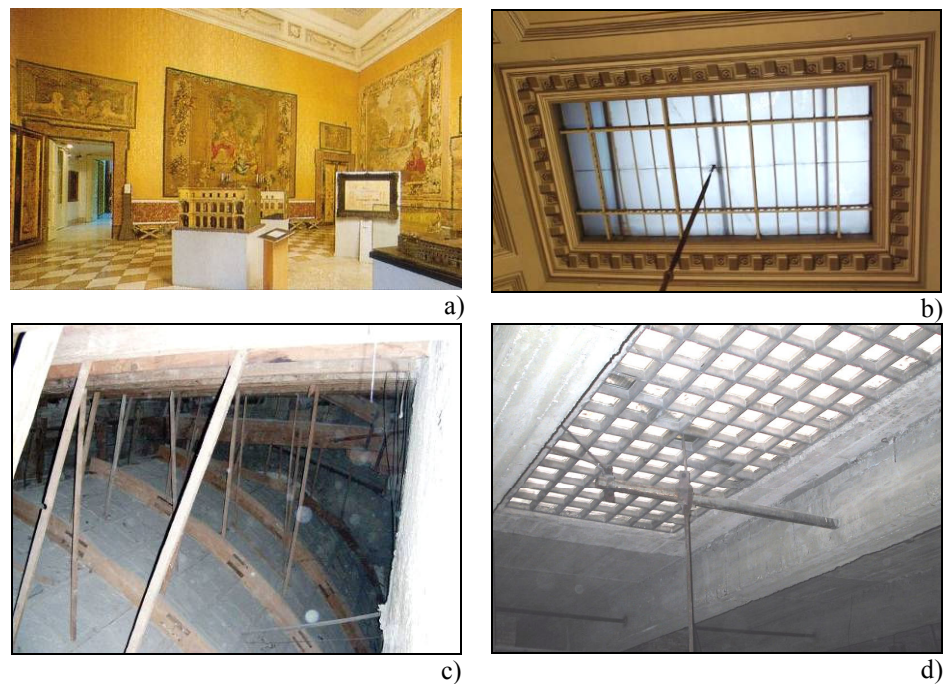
Guard Room (XXIX) – Geometrical survey: a) Internal; b) Central skylight; c) Vaulted ceiling-supporting structure connection; d) R.c. roof.
